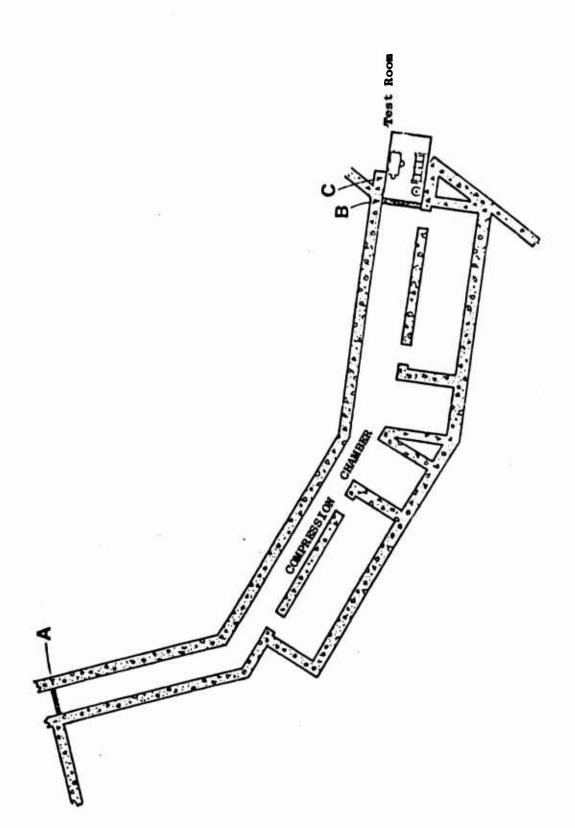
Sketch of Long Duration Flow Tunnel Facility.
